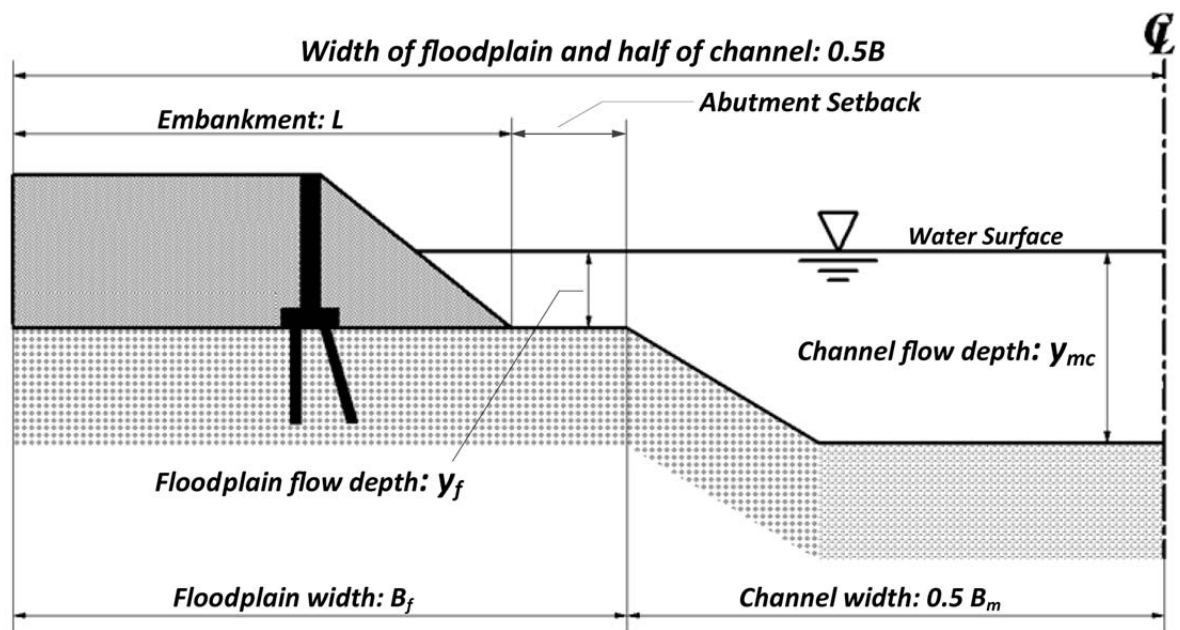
Typical cross section for bridges with setback abutments (from Benedict, 2003).
